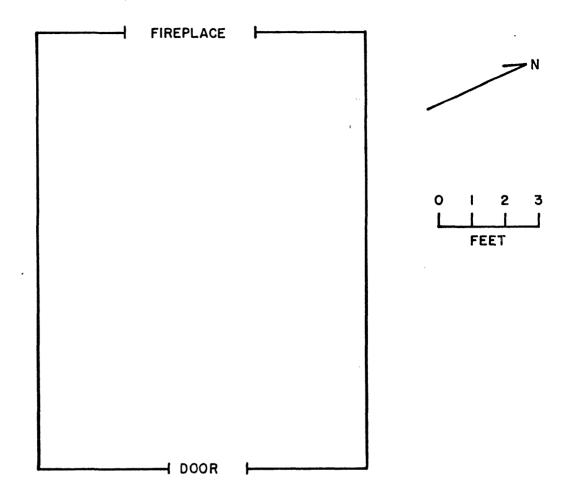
%. Camp No. 4. Plan of Building No. 2.
